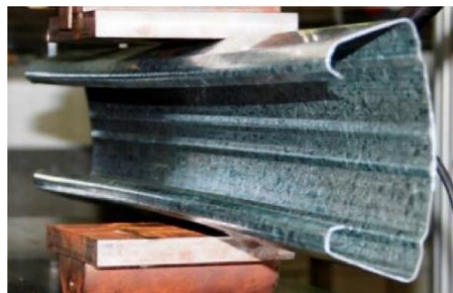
SupaCee section under ITF loading condition (Janarthanan et al., 2019)
